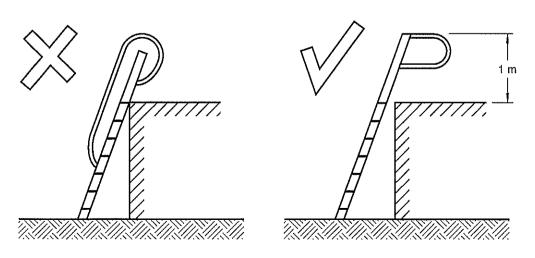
HANDRAIL DETAIL AT TOP OF INCLINED LADDER
